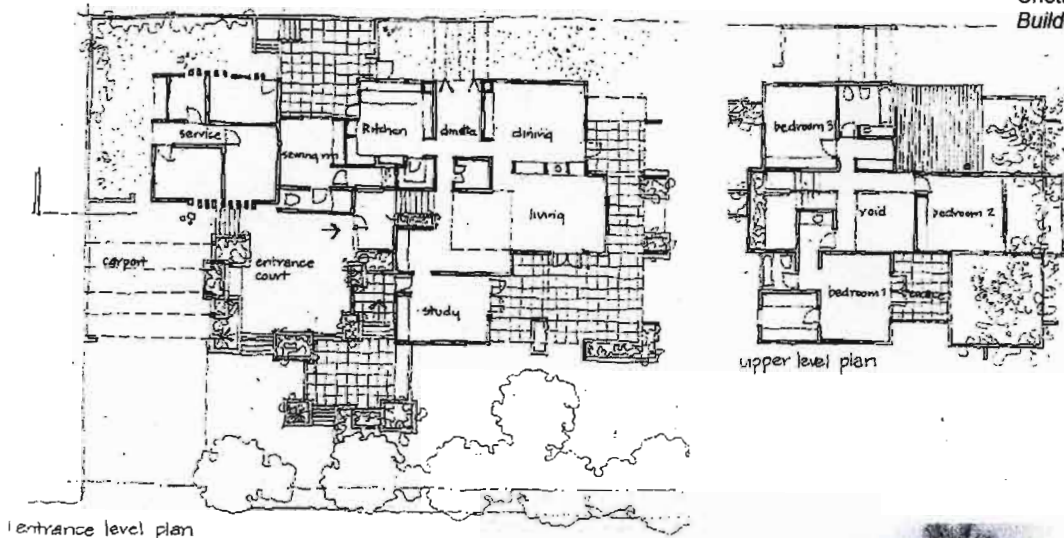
BDG – House Dr. Chetty (1969). Plans. Drawn by D. Jordaan.
